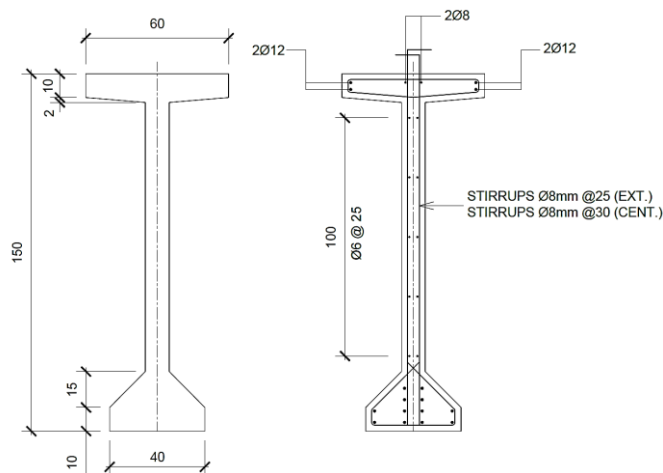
Geometry and Reinforcement detail of the prestressed beams (units in cm).
